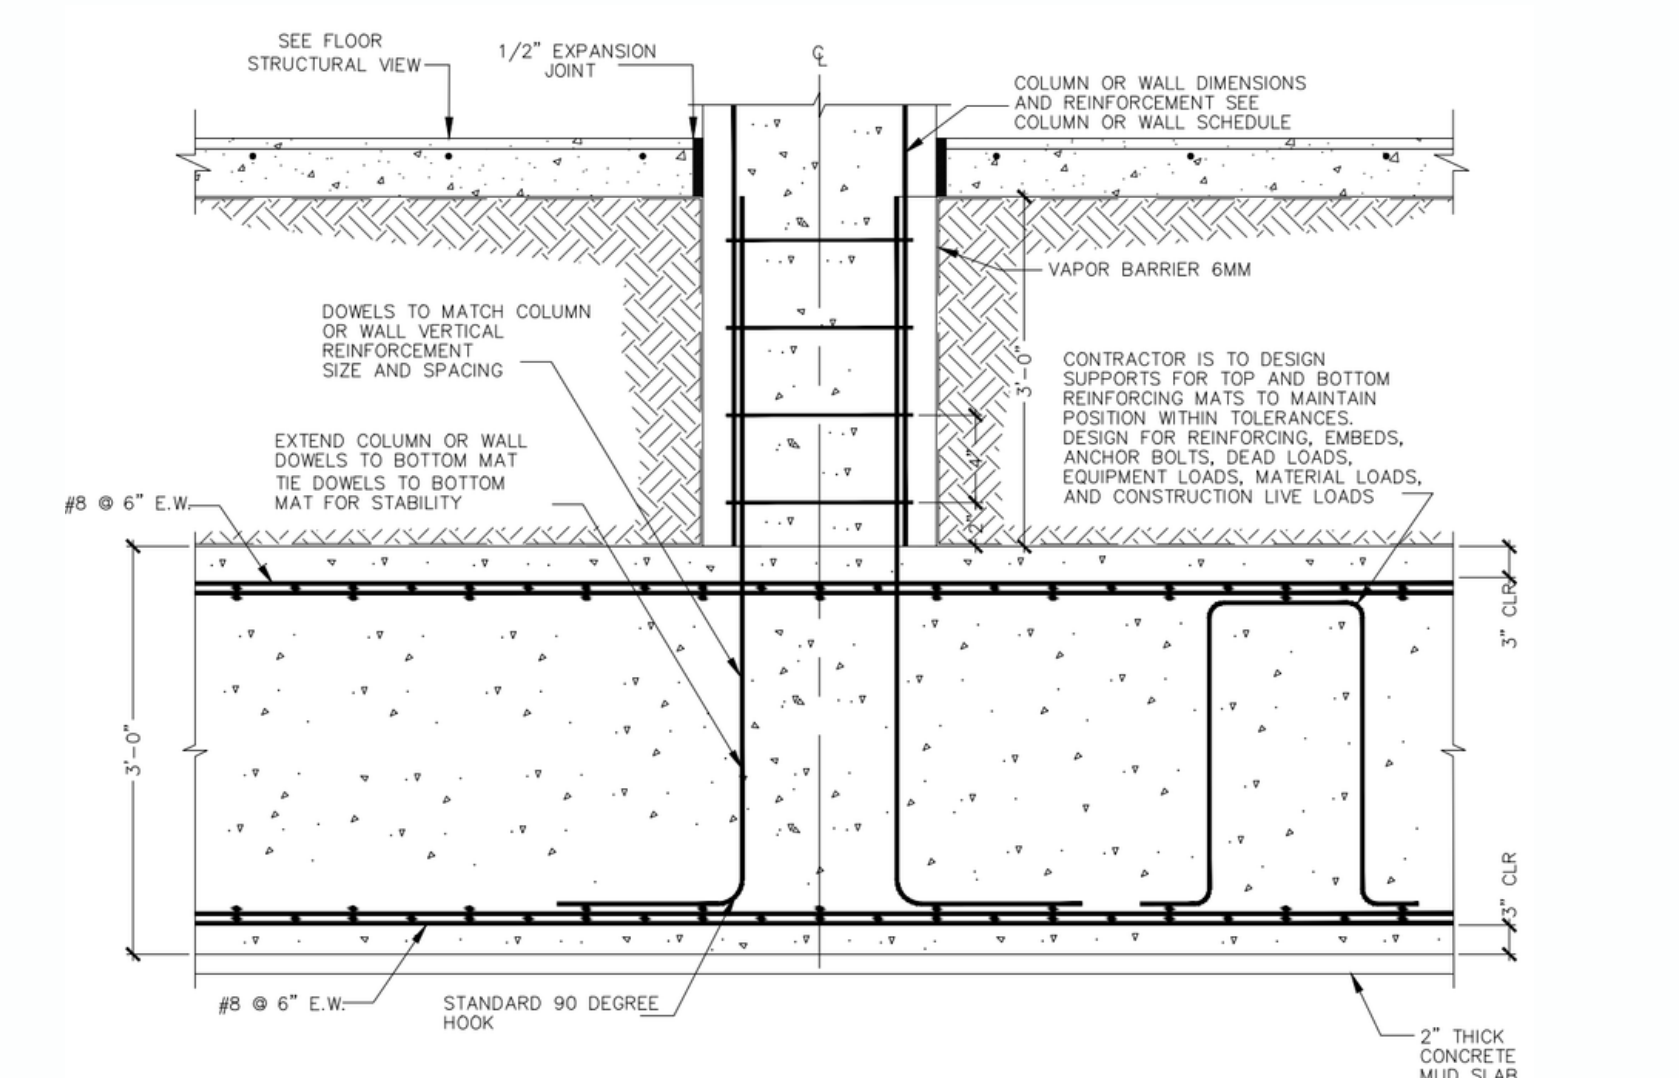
Multi-Level Parking Structure Foundation Reinforcement
